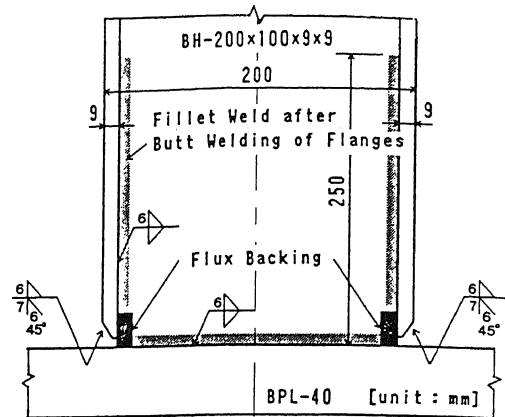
Welding details of low-cycle fatigue specimens.
